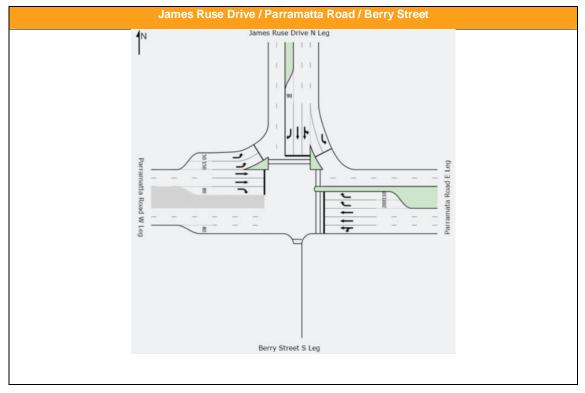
Intersection Layout - James Ruse Drive / Parramatta Road / Berry Street (Source: AECOM, 2012)
